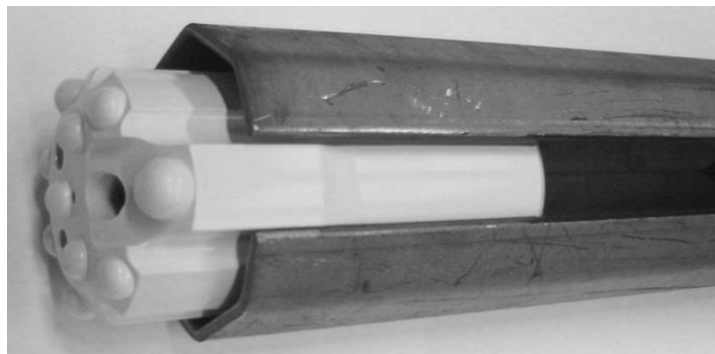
The C pile is an open steel section, installed using a new kind of an eccentric drill (Hyypä et al 2012).
